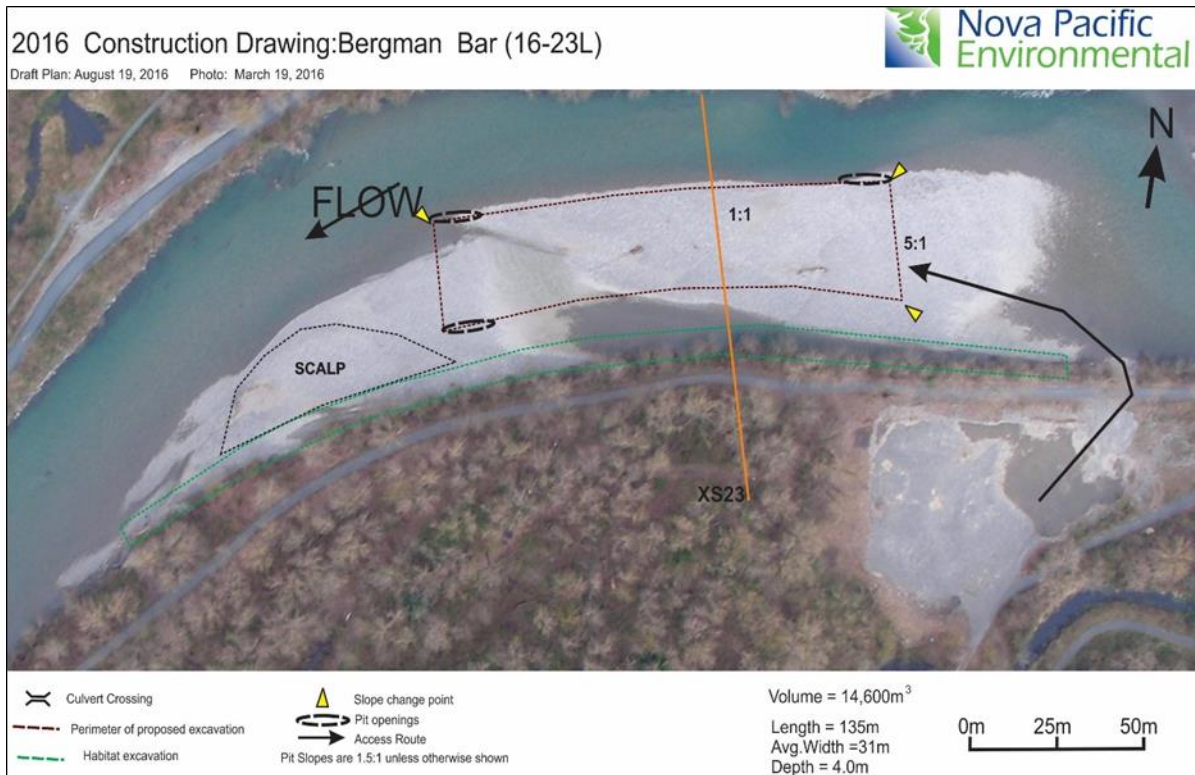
Aerial view of the Bergman Bar excavation plan. Photo taken March 19, 2016, drawing – August 19, 2016.
